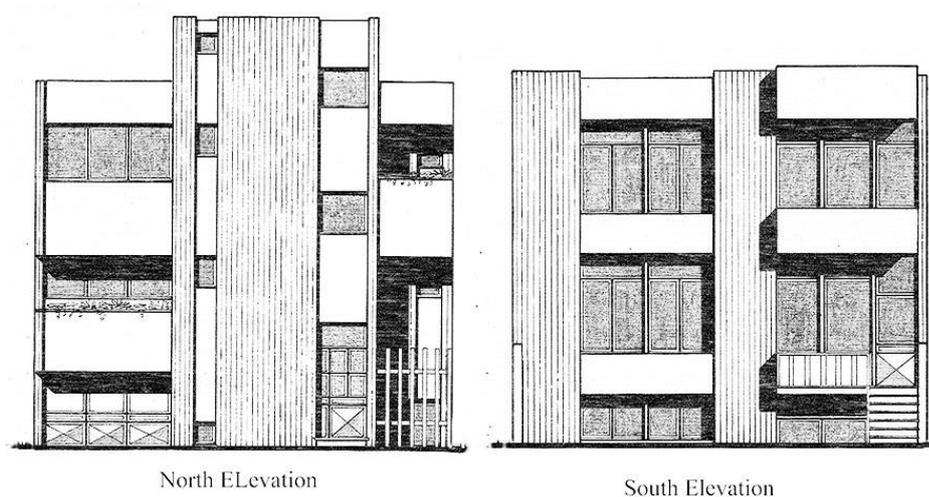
The comparison of openings in two facades of a house: left (street-face façade) right (the façade looks to the yard). source; (Mr Soltani's Archive)
